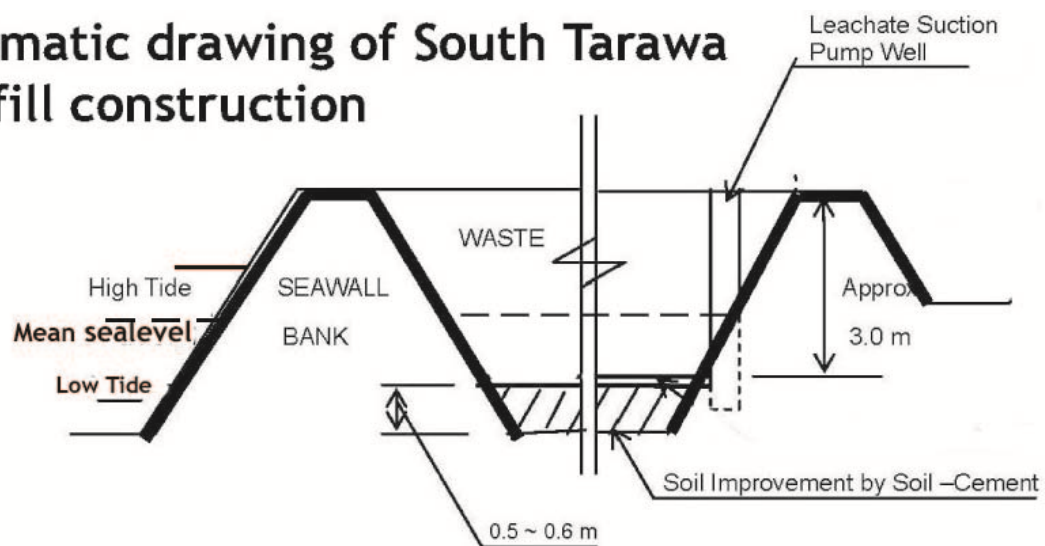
Cross-sectional drawing of South Tarawa landfill construction.
